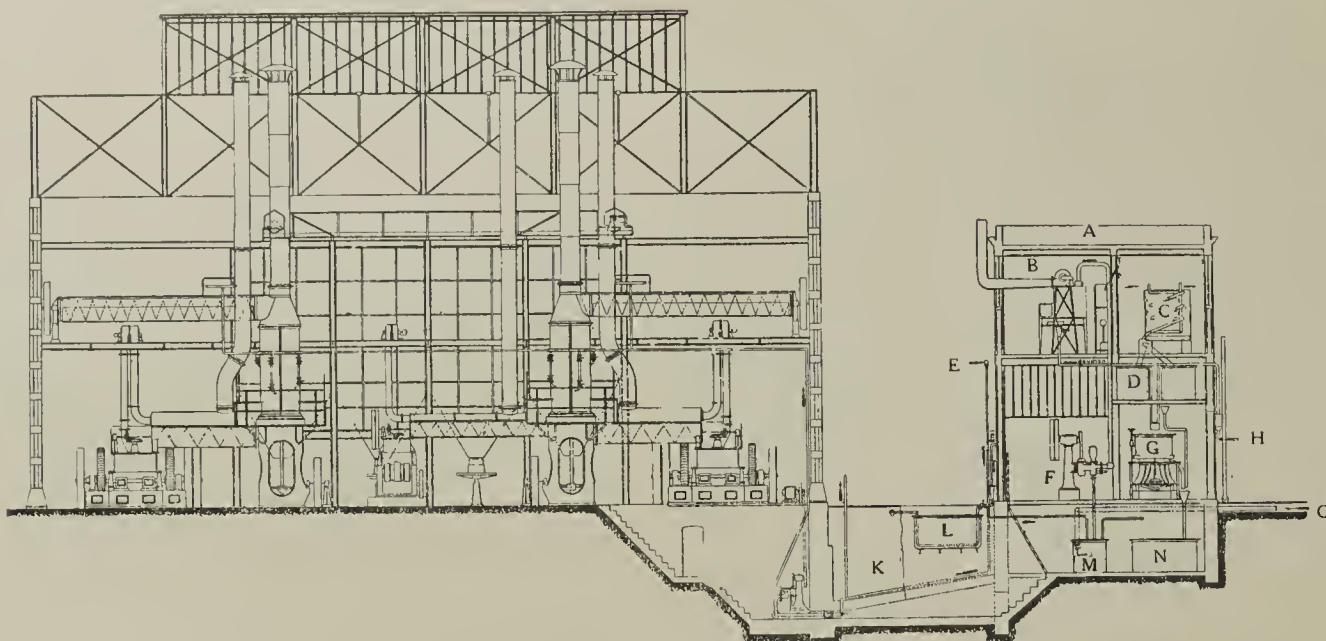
LONGITUDINAL SECTION OF BRIQUETTING PLANT.
